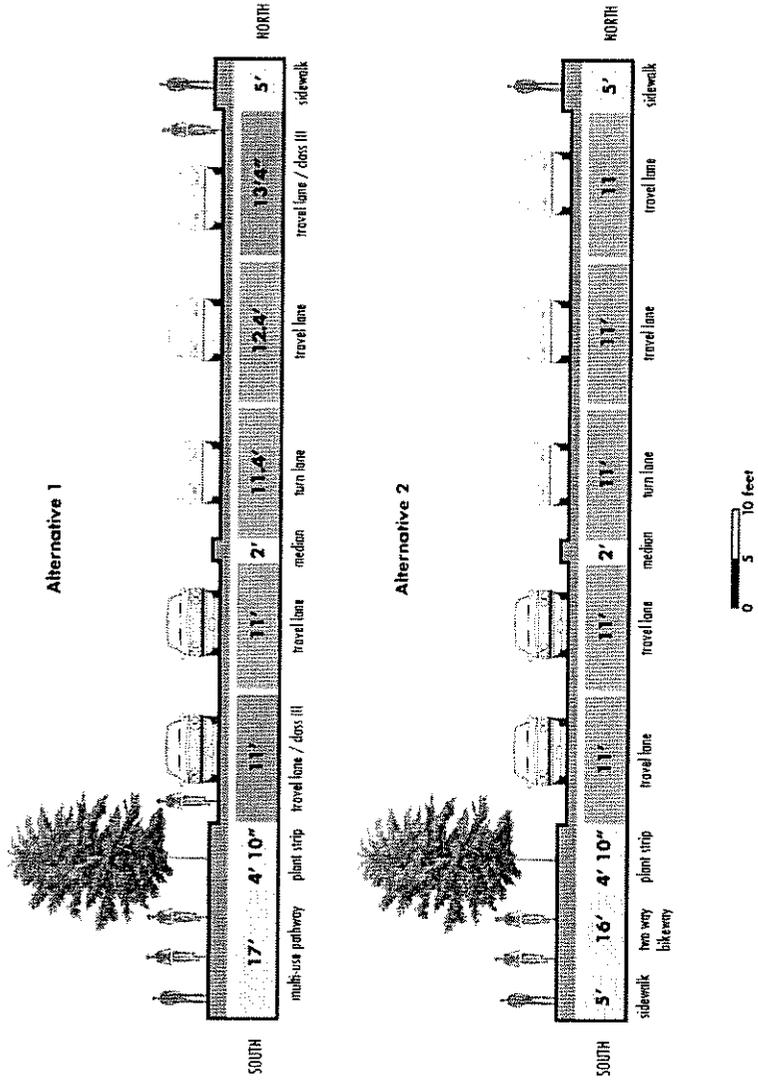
Section of Proposed Improvements for Project 12: Second Street (West Street to East Street) (Medium-Term Improvement)
